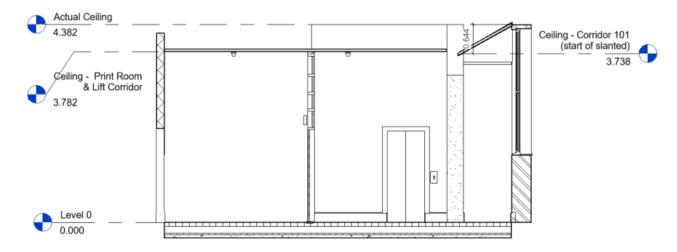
Cross section of ceilings from Print Room to Lift Corridor to Corridor 101
